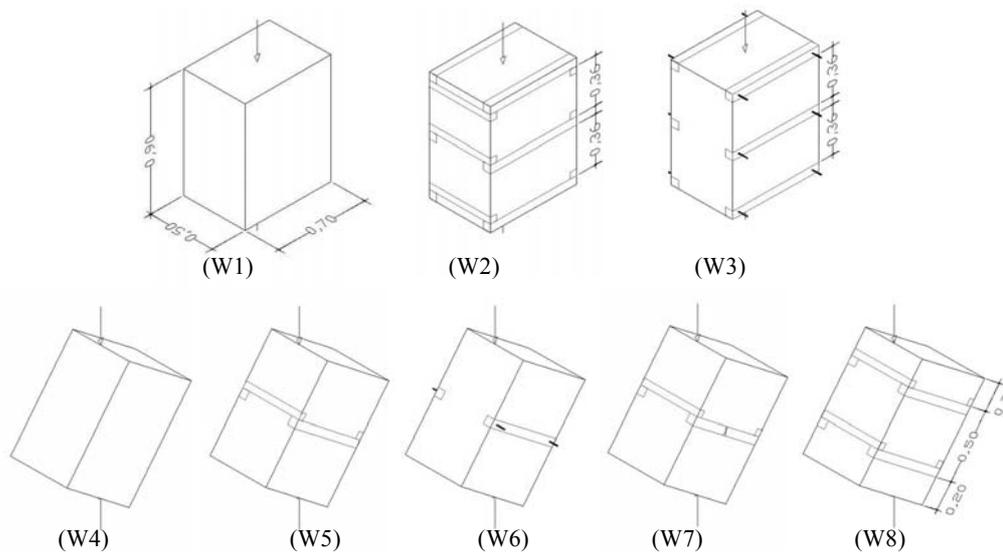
Geometry of specimens: (W1)-(W3) tested in compression, (W4)-(W8) tested in diagonal compression.
